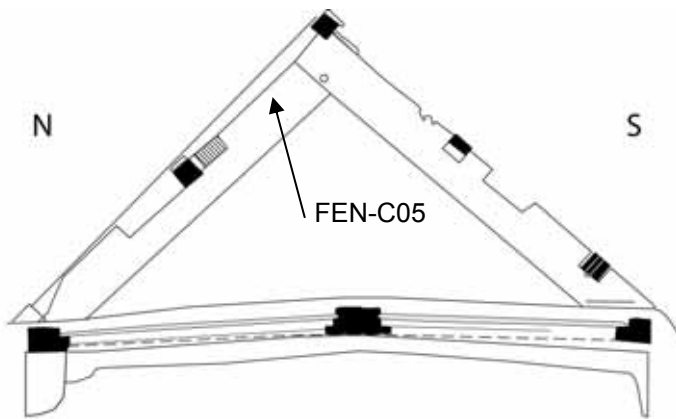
Truss 3, showing the location of sample FEN-C05 (based on Truss 4 provided by John Allen)
